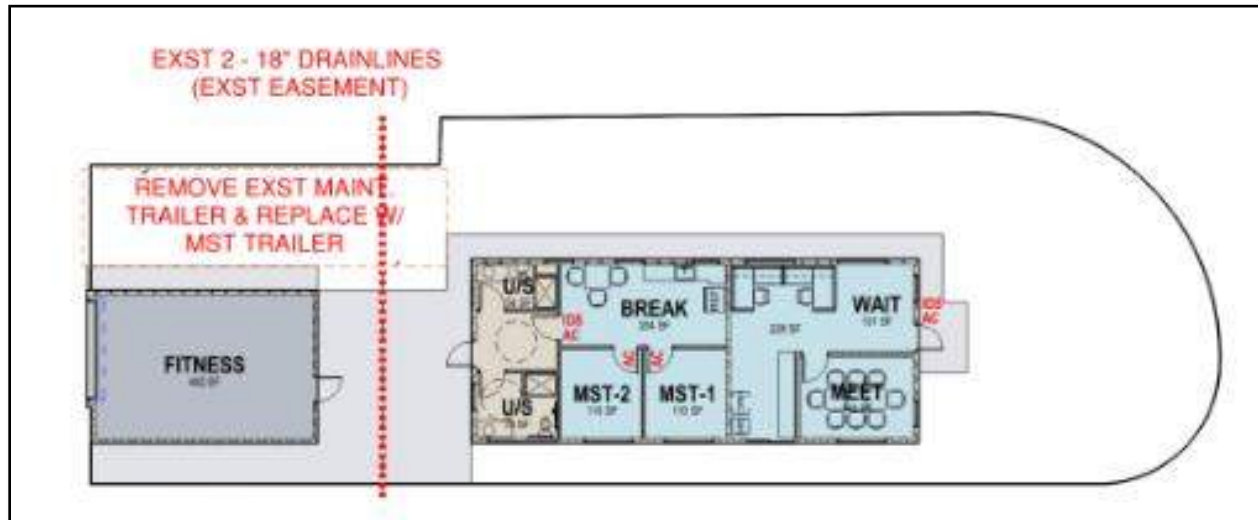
Proposed Floorplan for Renovated Existing Facility to Accommodate MST Maui
